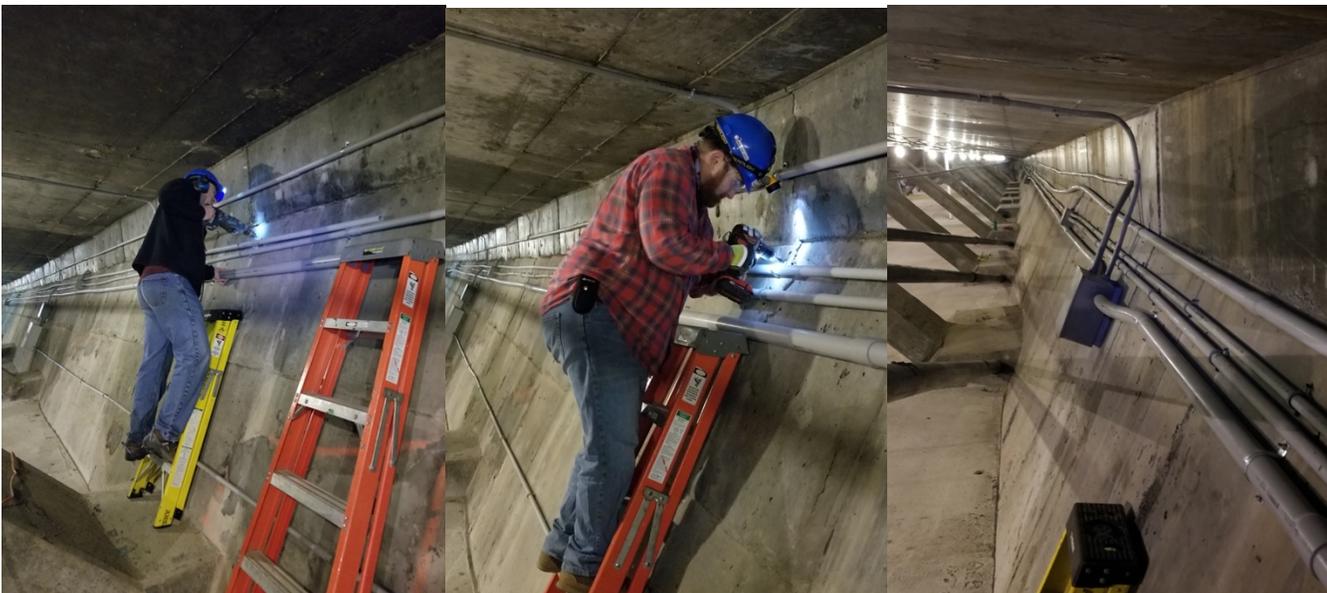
Fiber optic sensor conduit installation on the first span (A anchors) from the Prospect side of the PNB
